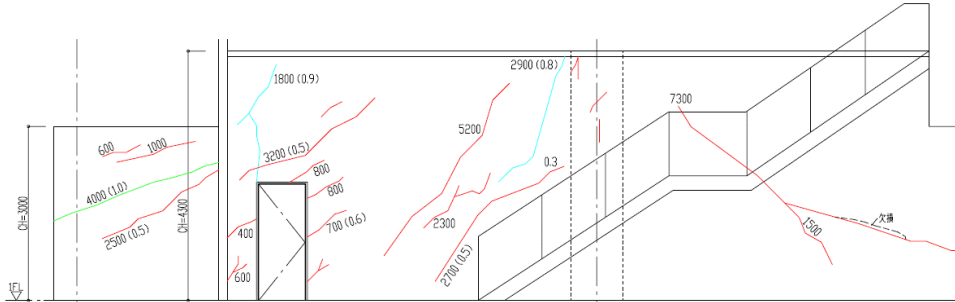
Cracking patterns on west entrance lobby. Numbers show length and width of cracks related to Figure 2.
